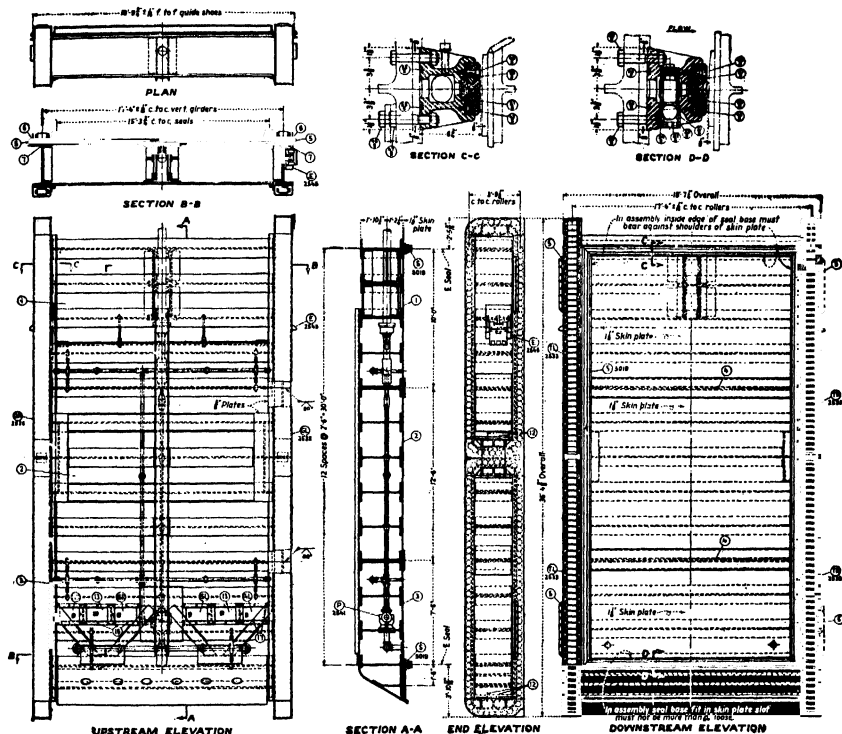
Fifteen-by-29.65-ft penstock coaster-gate leaf. Sections CC and DD show enlarged views of hydraulically operated sealing mechanism, as installed at Grand Coulee Dam.
